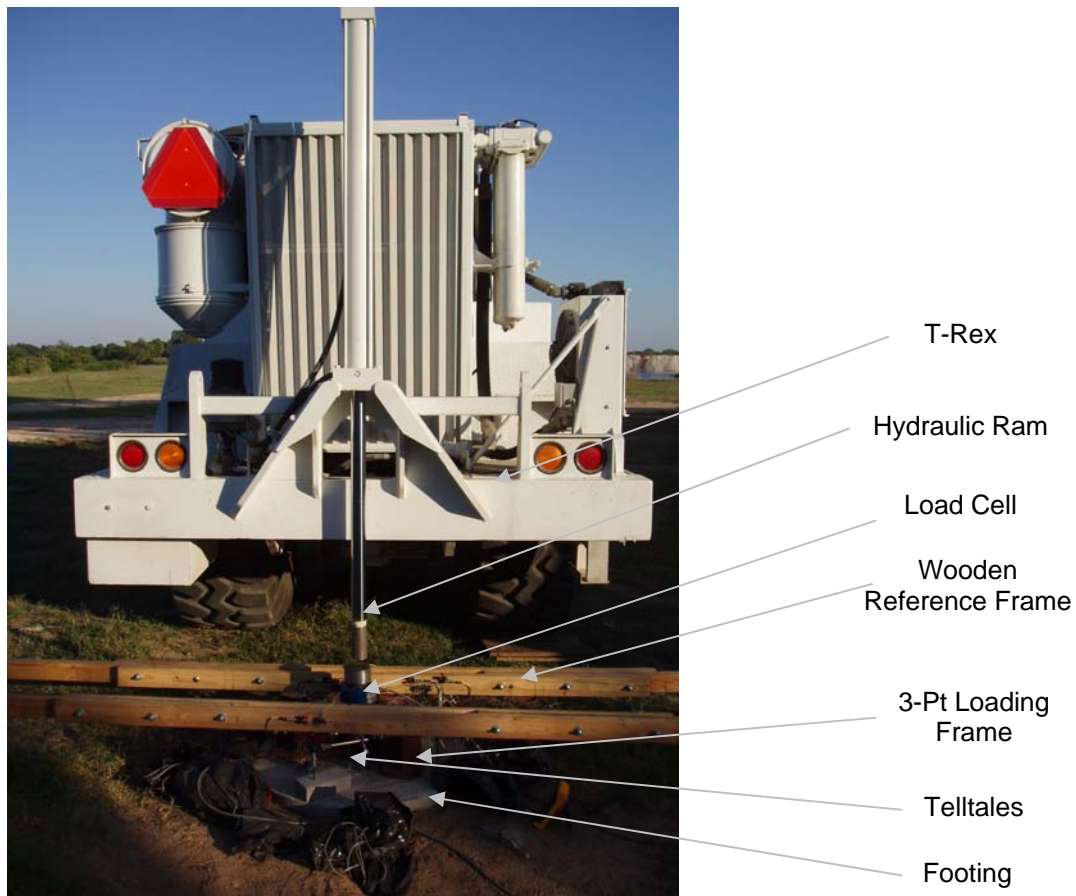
Arrangement Used to Load the Footing With the Hydraulic Ram on the Back of T-Rex
